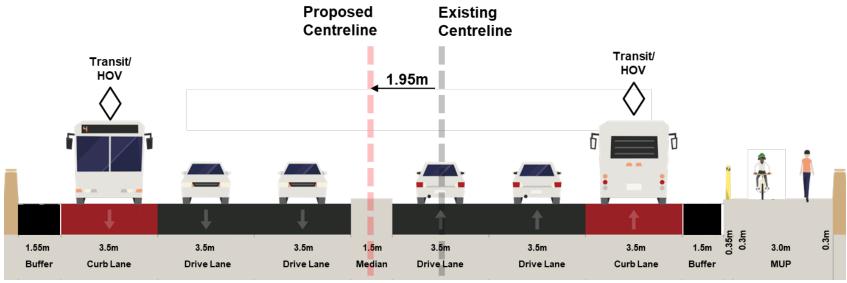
Alternative 1 - No Structure Widening, 1 MUP (Road Shift)
